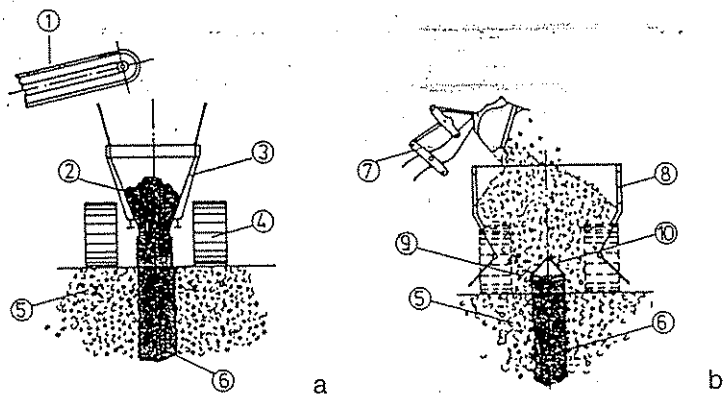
Internal sealing of asphaltic concrete. Cross sections of the placing unit (courtesy of Strabag Bau-AG).
